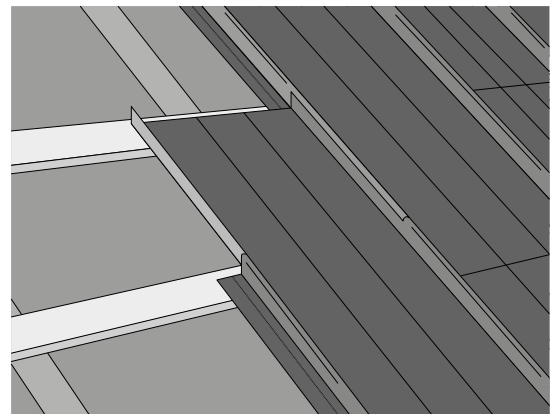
LOWER PANEL WITH REMOVED LOCK PROFILES
